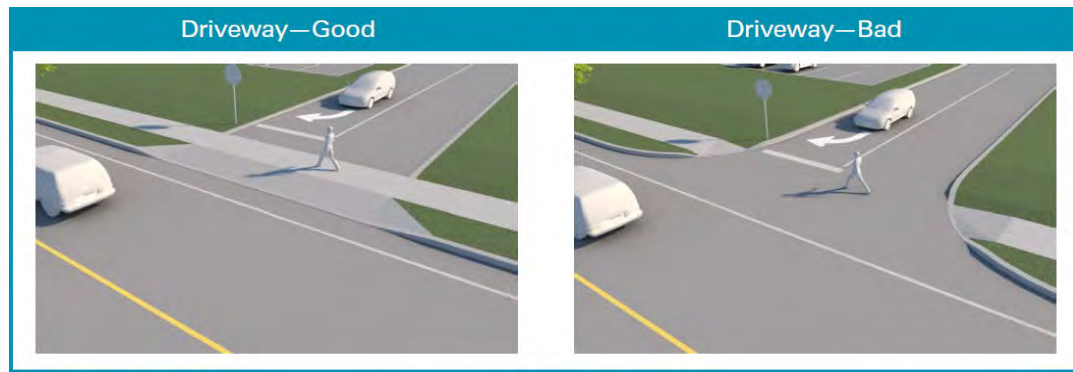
Sidewalk and Driveways (Source: CSDG)
